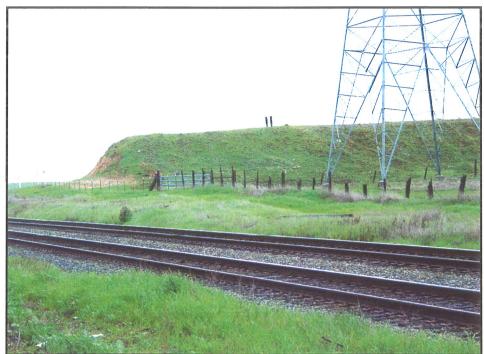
Known as the "mound" the earthen ballast remains of the SNRR Vacaville branch line located at the intersection of Vanden Road. View NE.
